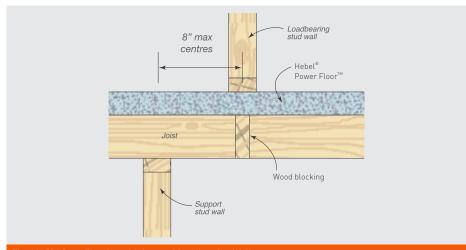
Platform Flooring with Internal Loadbearing Wall.
